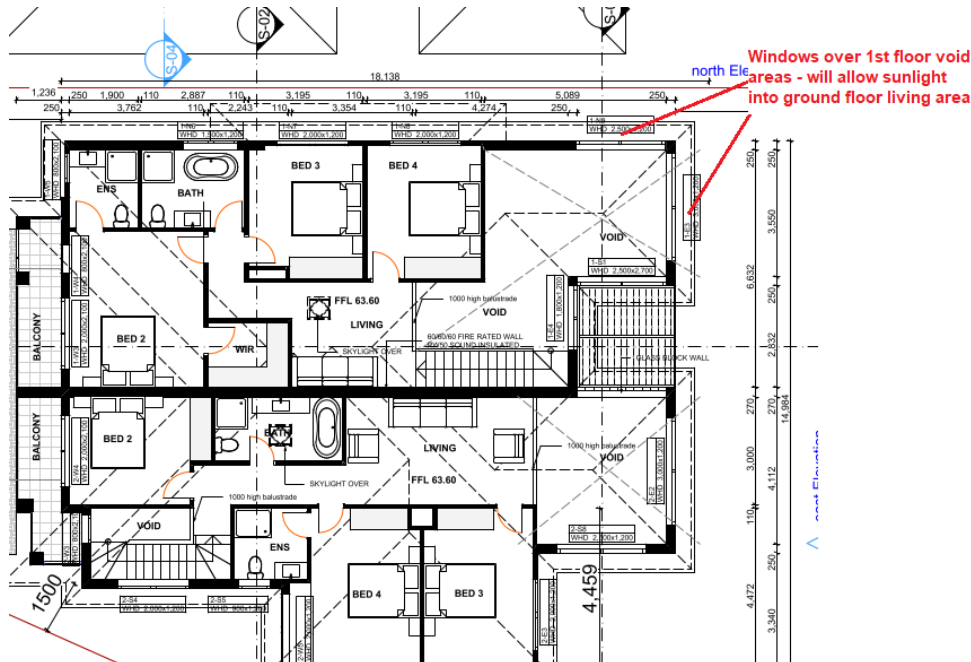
1st floor plan with void area with side and rear windows. This allows sunlight to filter through to the rooms below.
